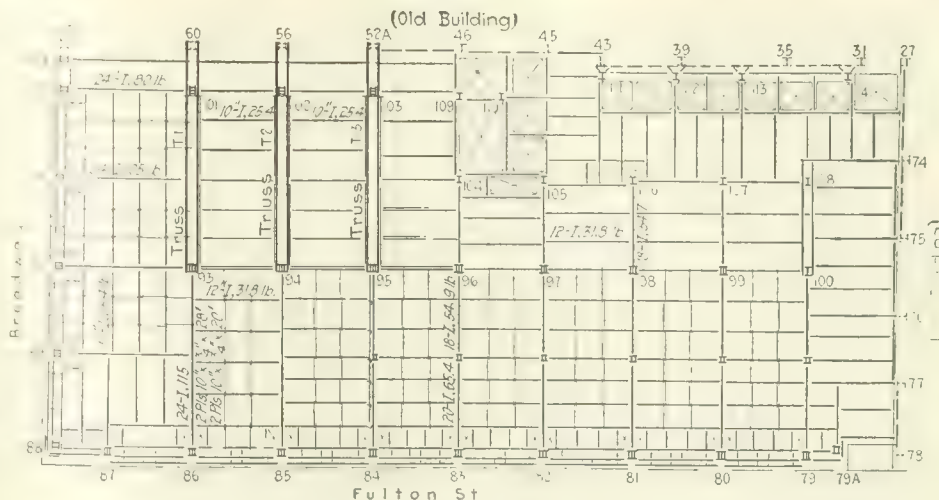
POSITION OF CANTILEVER TRUSSES IN THIRD-FLOOR FRAMING PLAN
